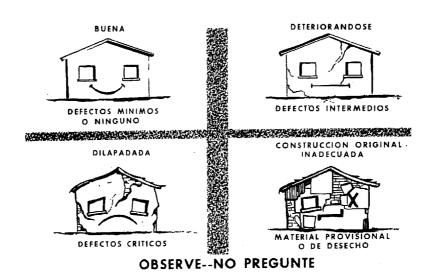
This sketch from the filmstrip on "Condition of a Housing Unit" will help you remember the four categories. Be sure you mark the condition of each housing unit you enumerate, whether it is occupied or vacant.
